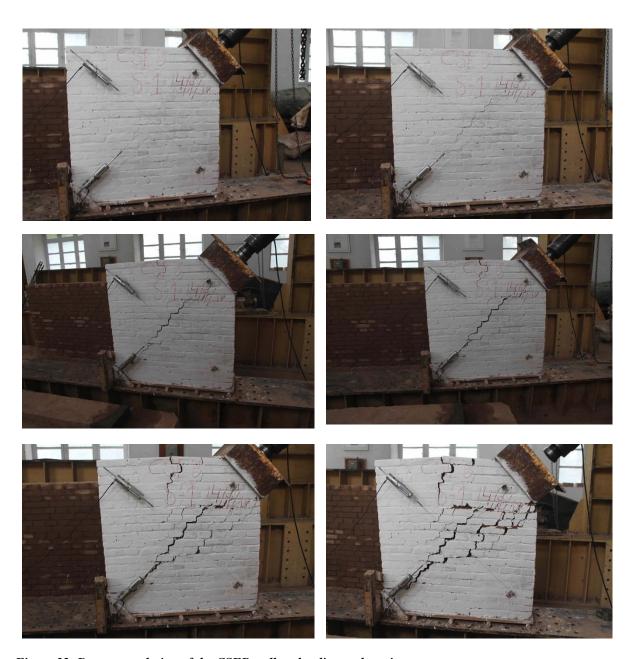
Damage evolution of the CSEB wall under diagonal tension test
